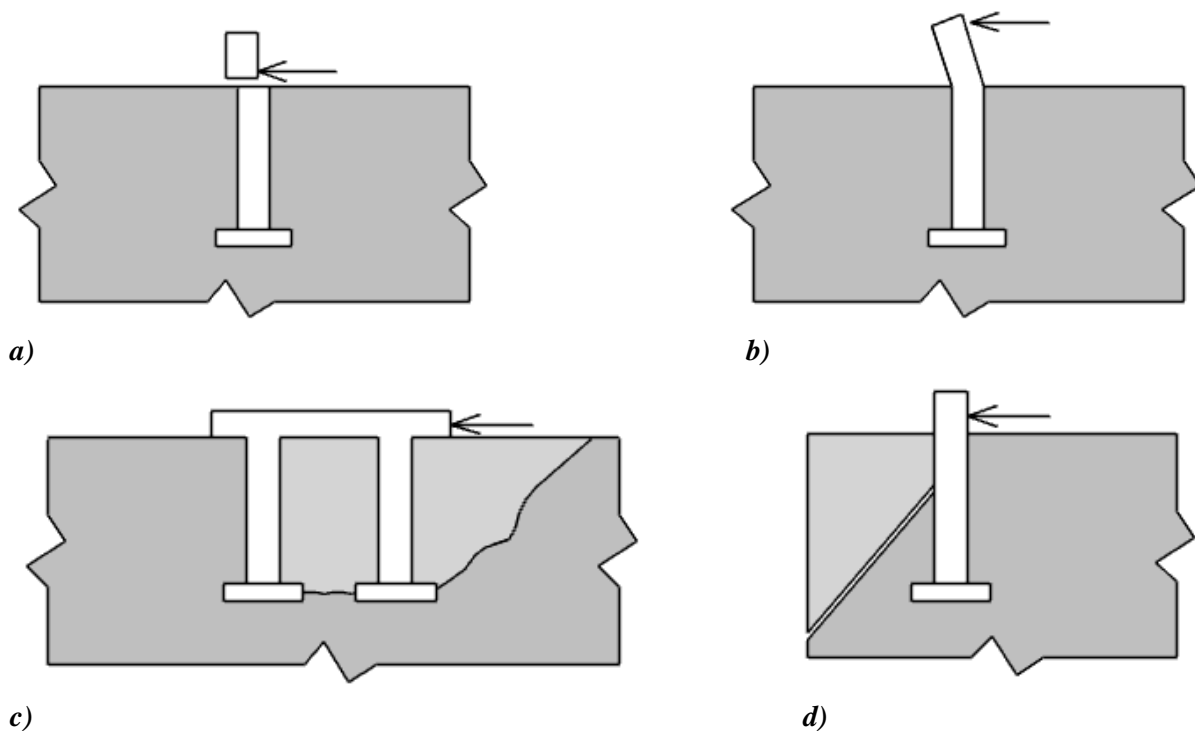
Failure modes of anchorages under shear-loading: a) steel failure, b) steel failure with a lever arm, c) pryout failure, d) concrete edge failure
